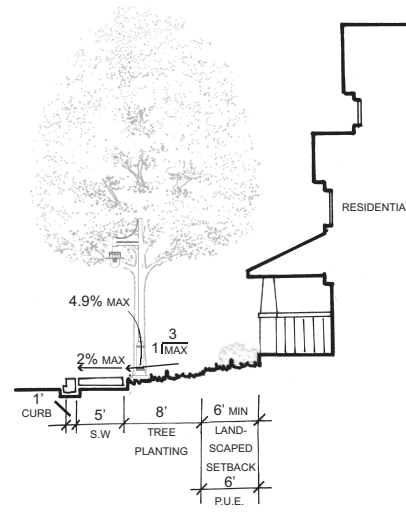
D.31: (Option B) Harbor Way Partial Cross Section at Parking with Monolithic Sidewalk ①
